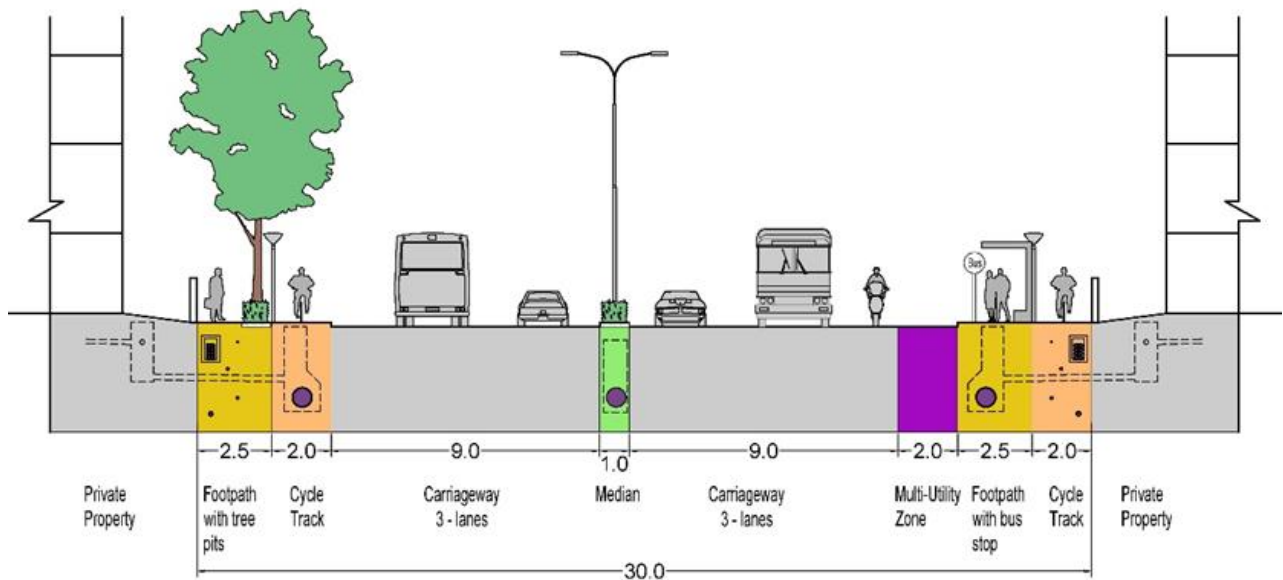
TYPICAL SECTION OF 30M WIDE ROAD
